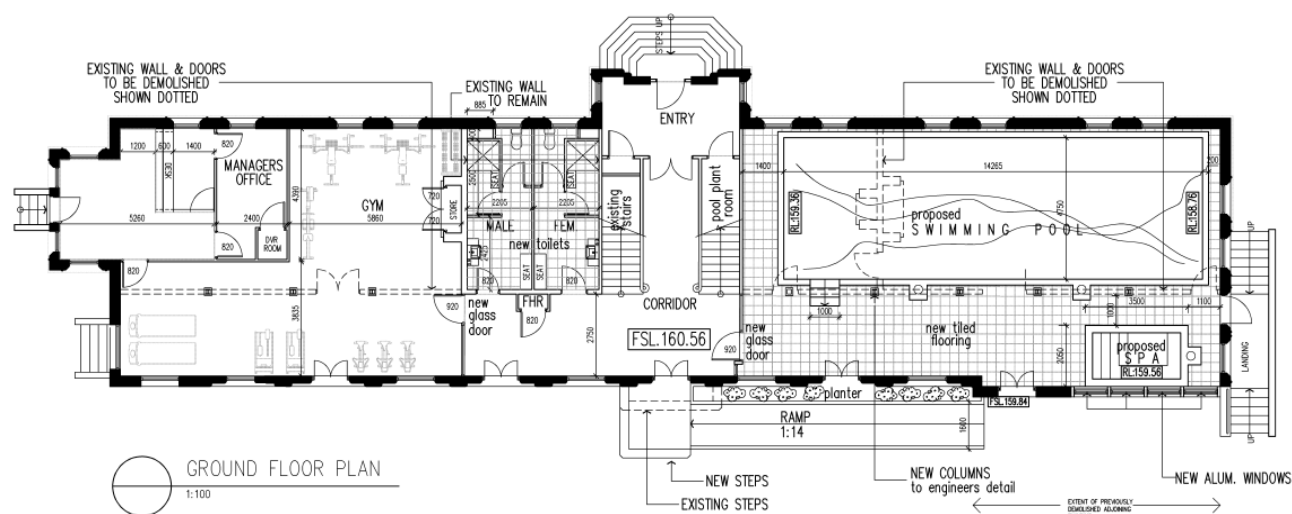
Proposed ground floor plan providing all of the community facilities on the ground floor. The proposal includes two residential units on the first floor (Figure 5).
